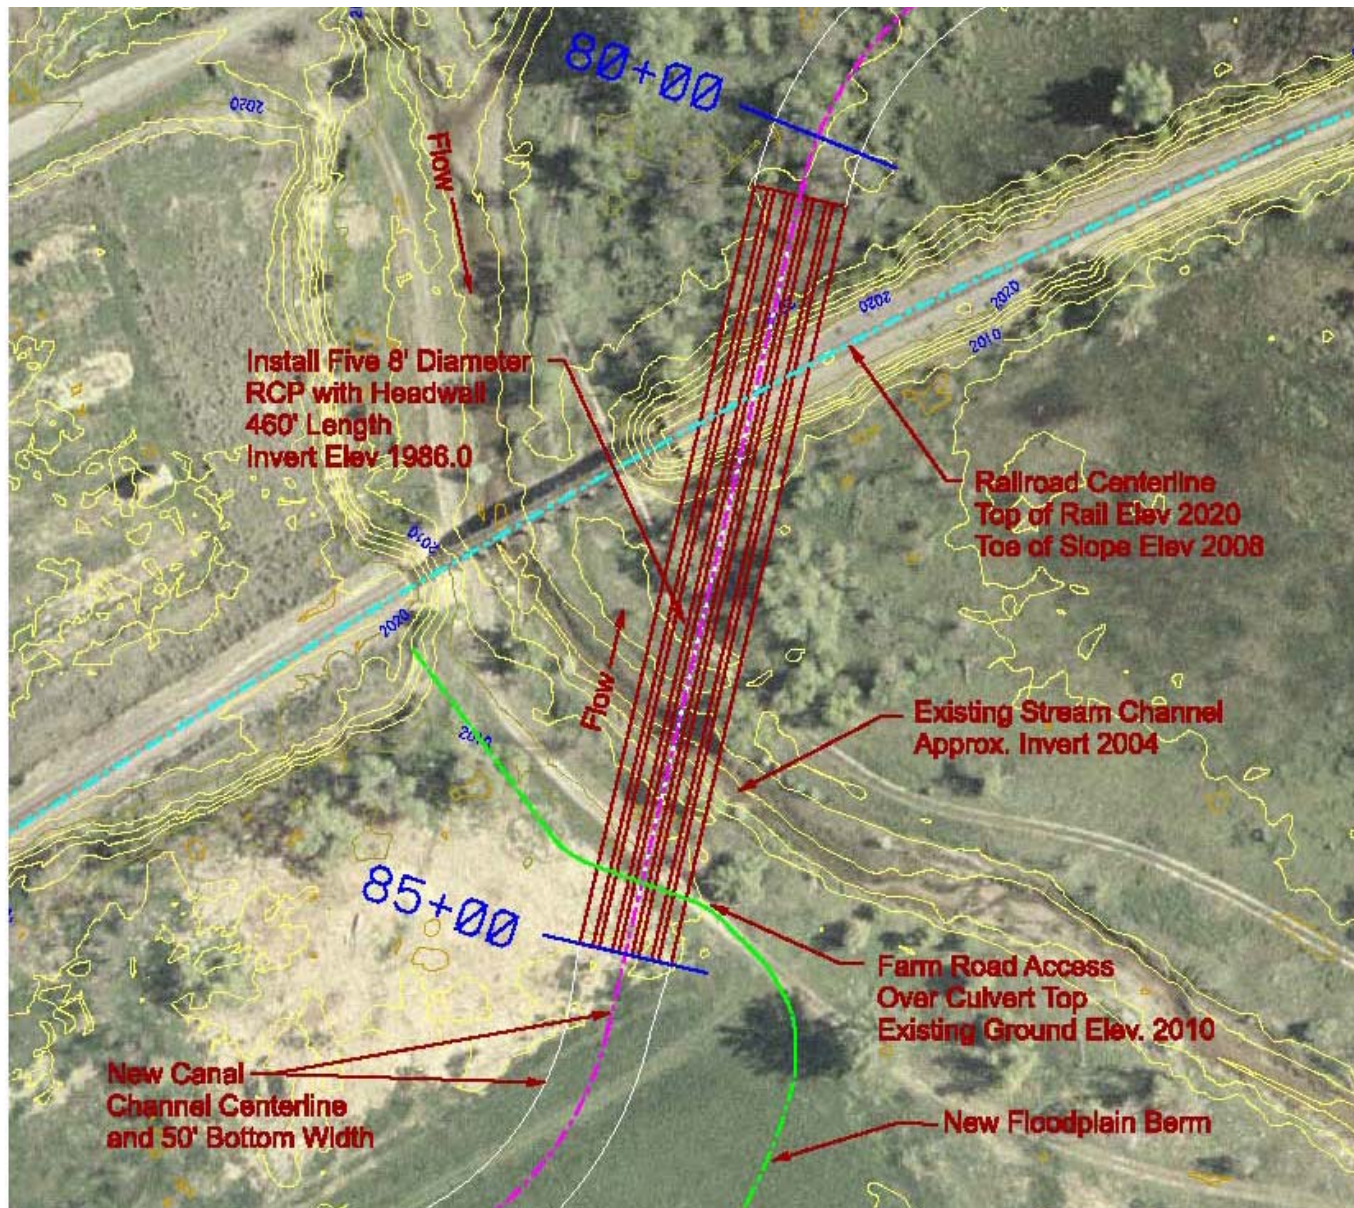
New Combined Stream and Railroad Culvert Crossing, Station 82+70.
